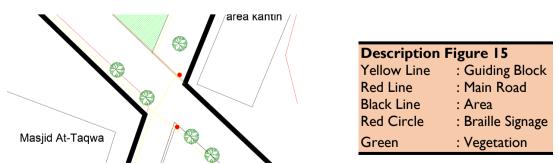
Plan of Guiding Block Path and Braille Signage of Open Space Connection to Majid At-Taqwa Unimus
